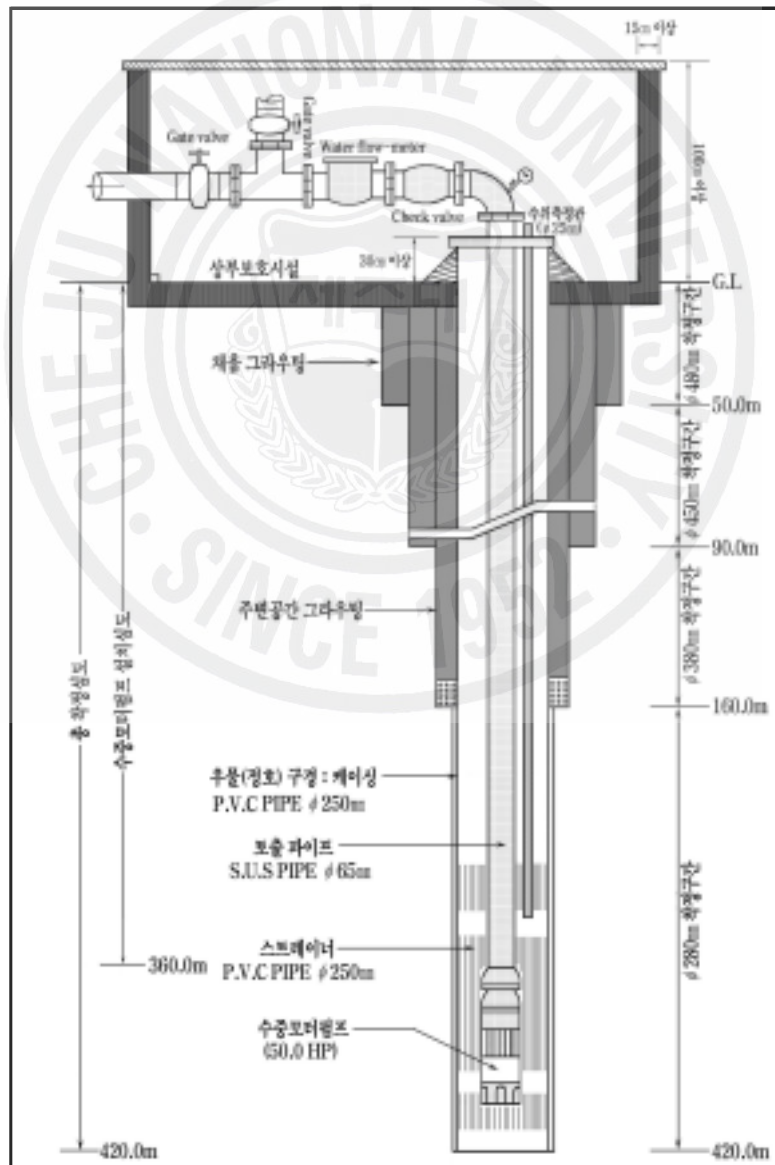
The Cross Section of the Underground Water Pumping Facility
